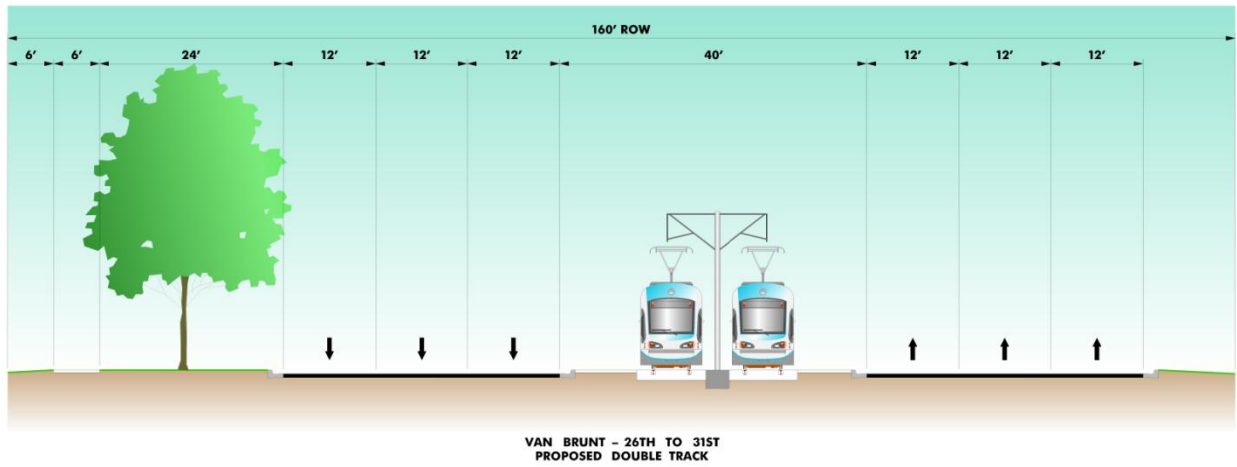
Enhanced Streetcar Truman Road Alignment Typical Section - Van Brunt from 26th to 31st
